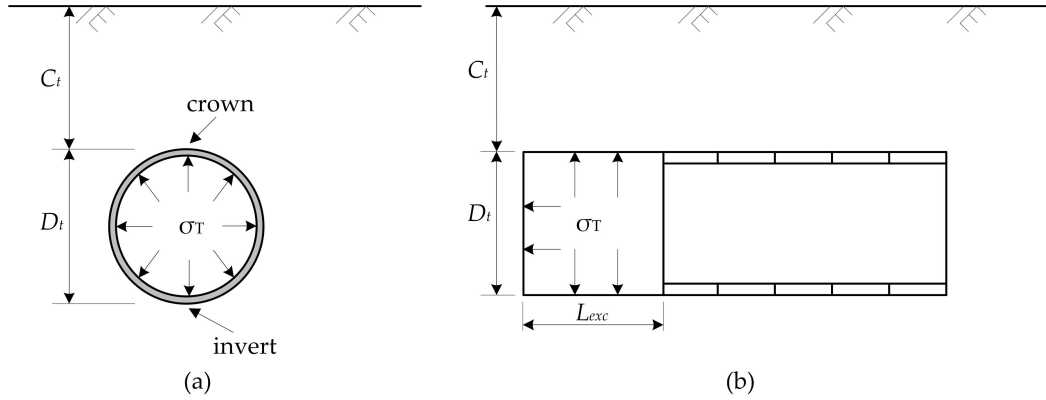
(a) Idealised cross-section of a typical tunnel, (b) tunnel heading (after Mair and Taylor, 1997)
